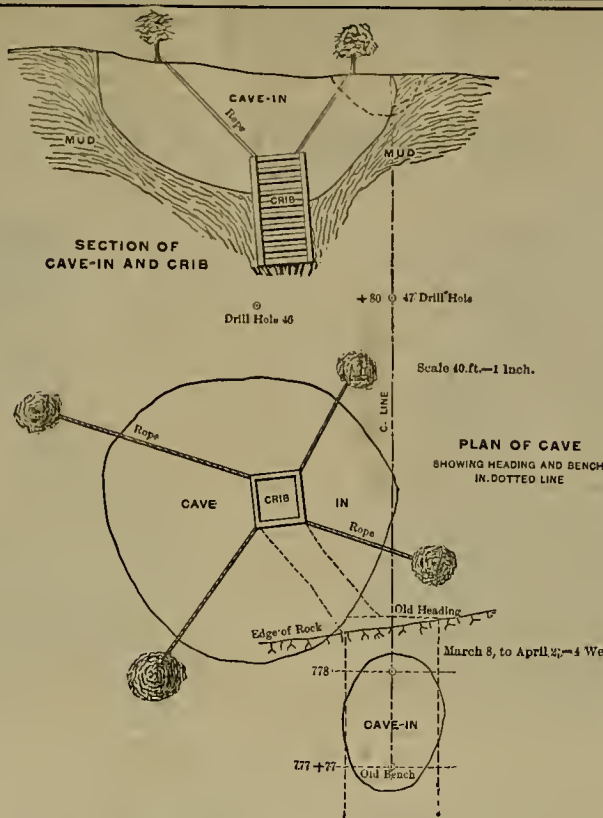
SECTION AND PLAN OF CAVE IN TUNNEL.
